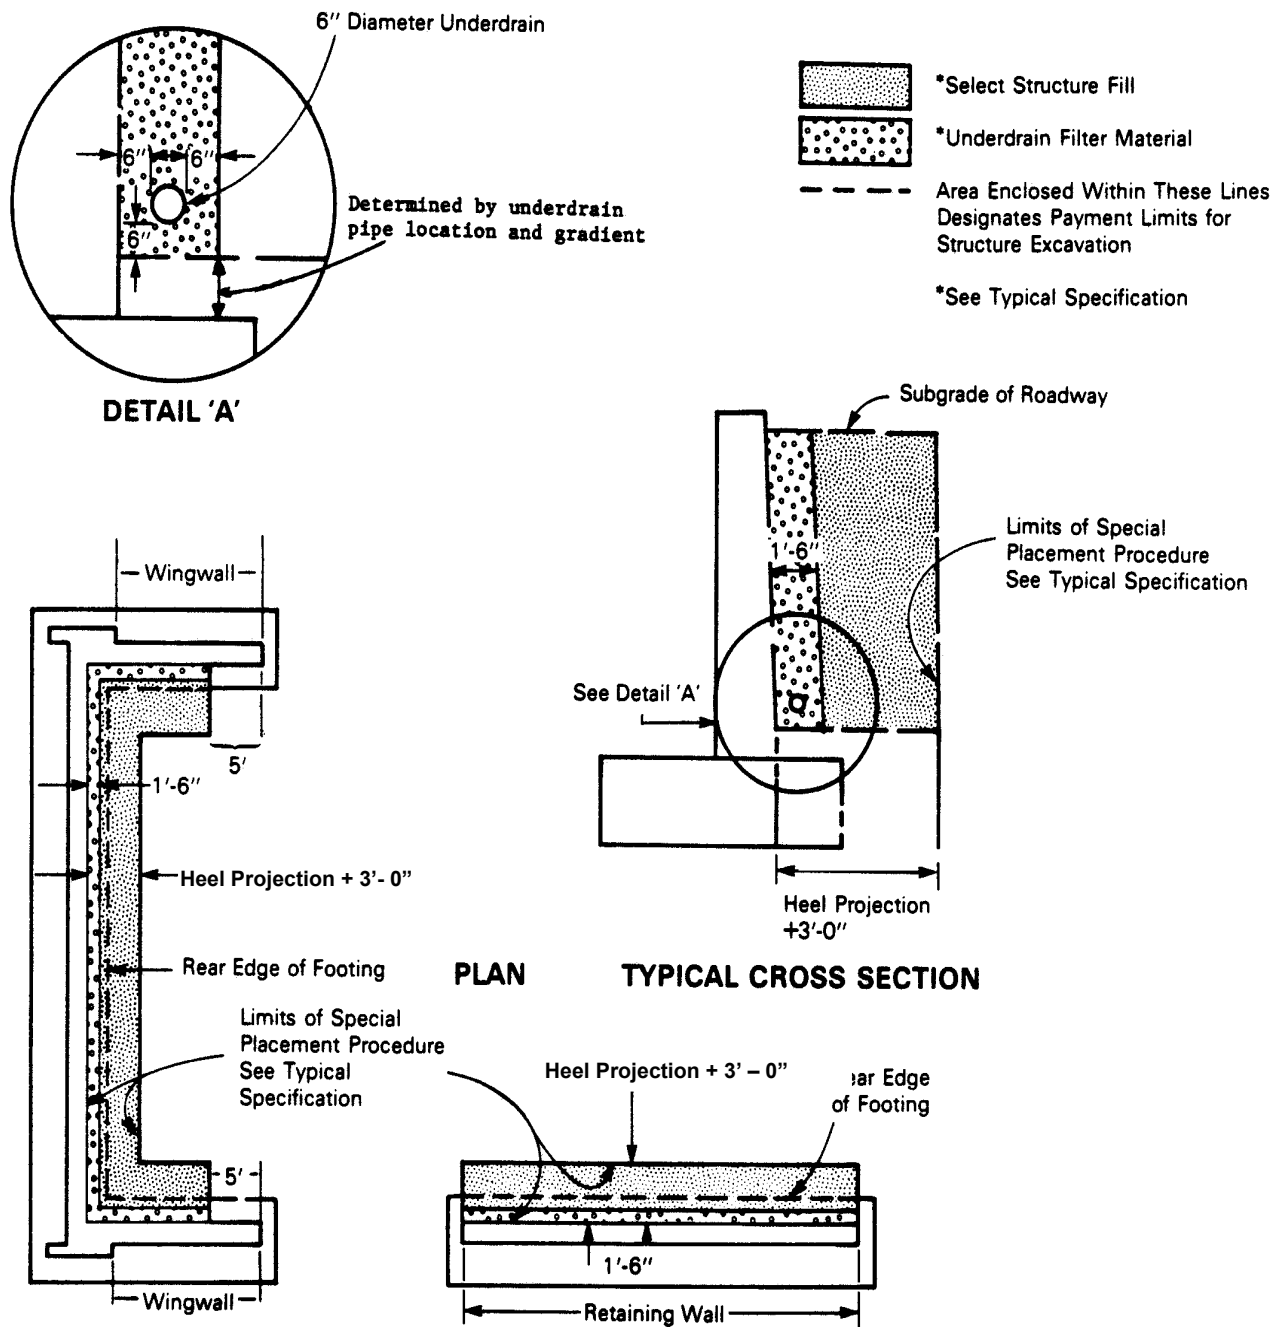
Structure backfill placement limits for porous drainage aggregate.
